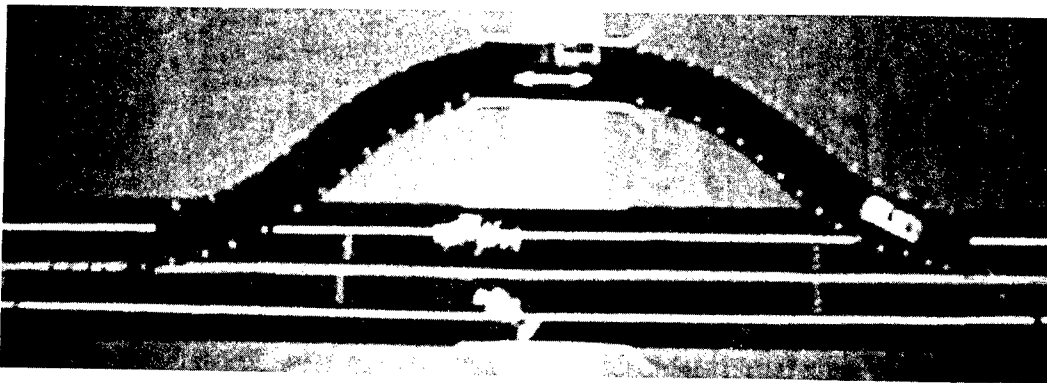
Close Bridge; Provide Structure for Alternating Traffic
